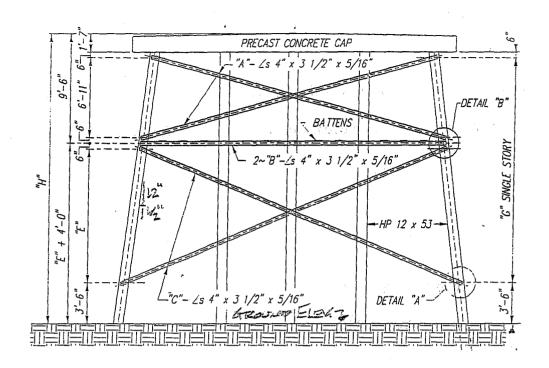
Typical ALDOT Bridge Pile Bent
